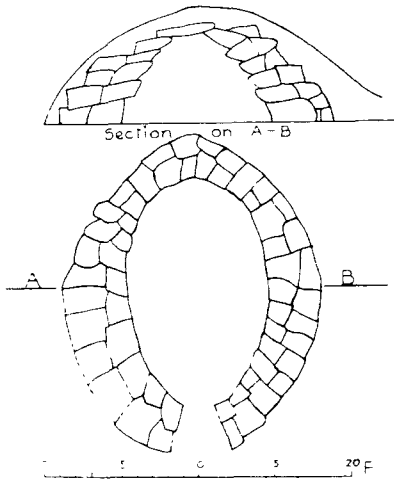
St Kilda: Plan and Section of Calum Mòr's House.
